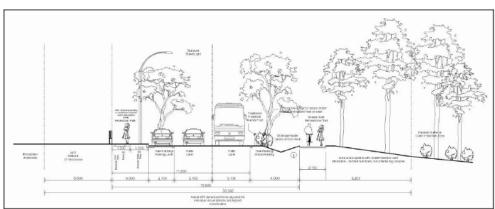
Road Section - Indicative Bushland or Riparian Edge Street. Source: Anterra Design Pty Ltd, 2007
